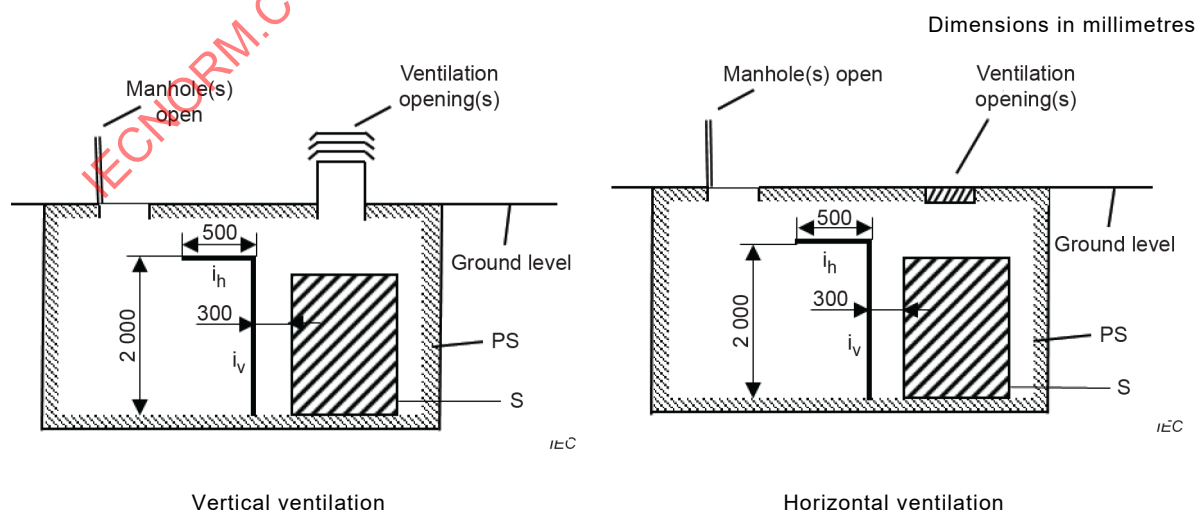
j – Protection of operators in front of the high-voltage switchgear in a walk-in type underground prefabricated substation
